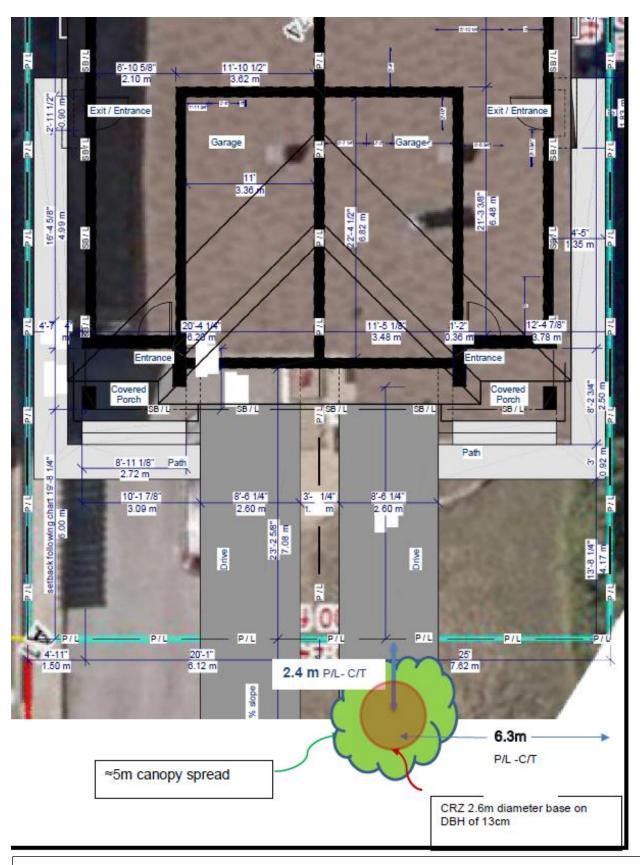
Shows Tree No. 1 C/T (Centre of Trunk) in relation to the P/L (Property Line). CRZ is highlighted in red. New construction foot print superimposed over existing building foot print supplied by Catalli Inshaw Design.
